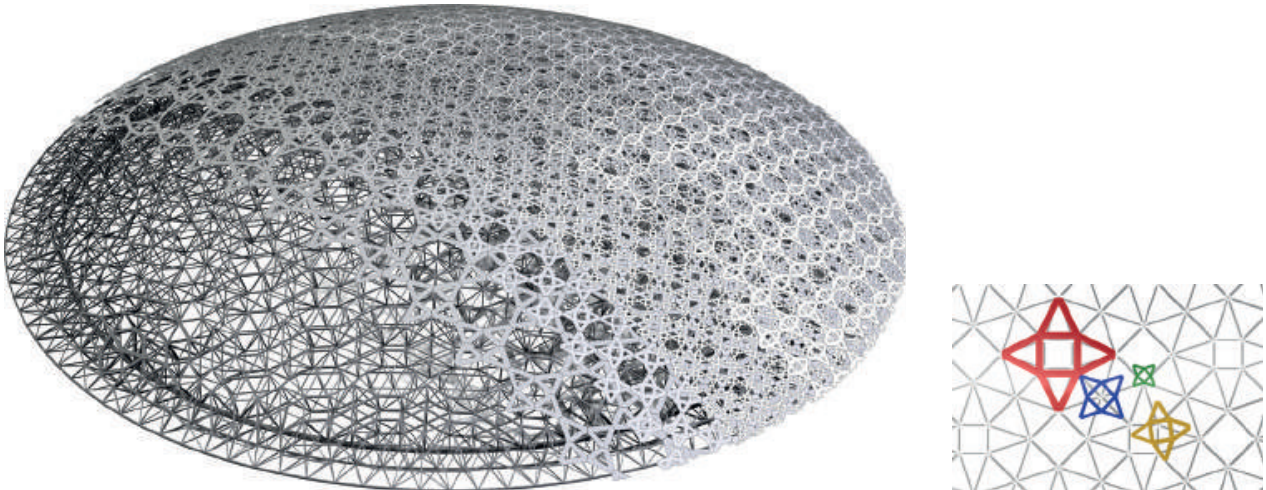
Layers of aluminium cladding enveloping structural steel and possible relative positions.
